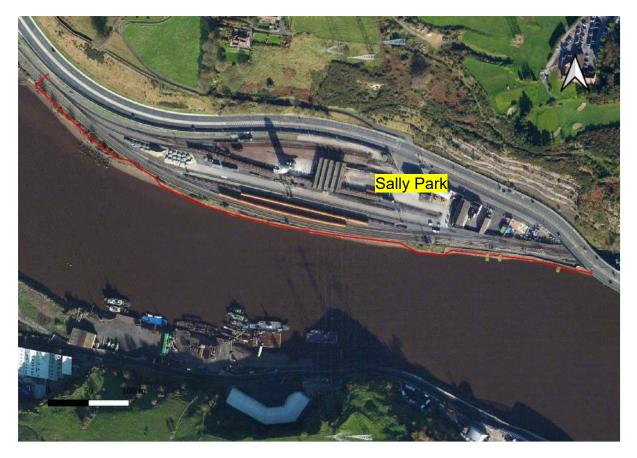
Location and Extent of the proposed Flood Defence Wall at the North Quays area
